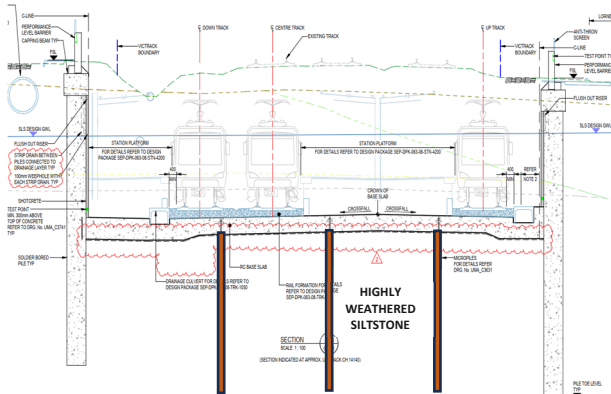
Cross section showing bored pile retaining walls connected with base slab and held down by micropiles
